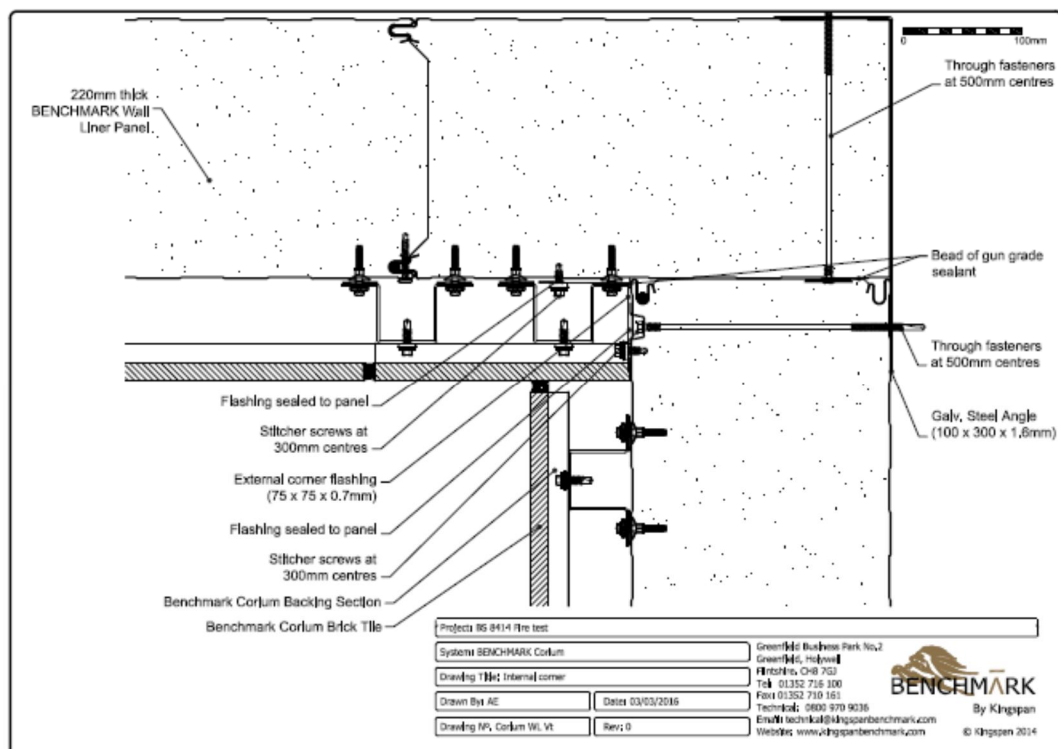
Construction of the System showing the panel fixings, top hat and Corium brick details.
